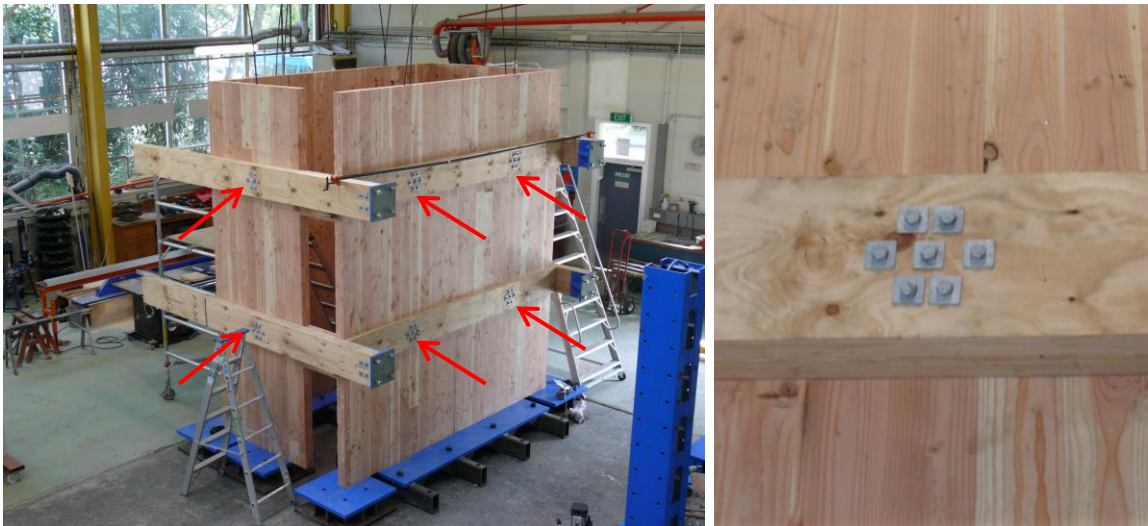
Test specimen with wall-to-collector beam connections for the low seismic option
